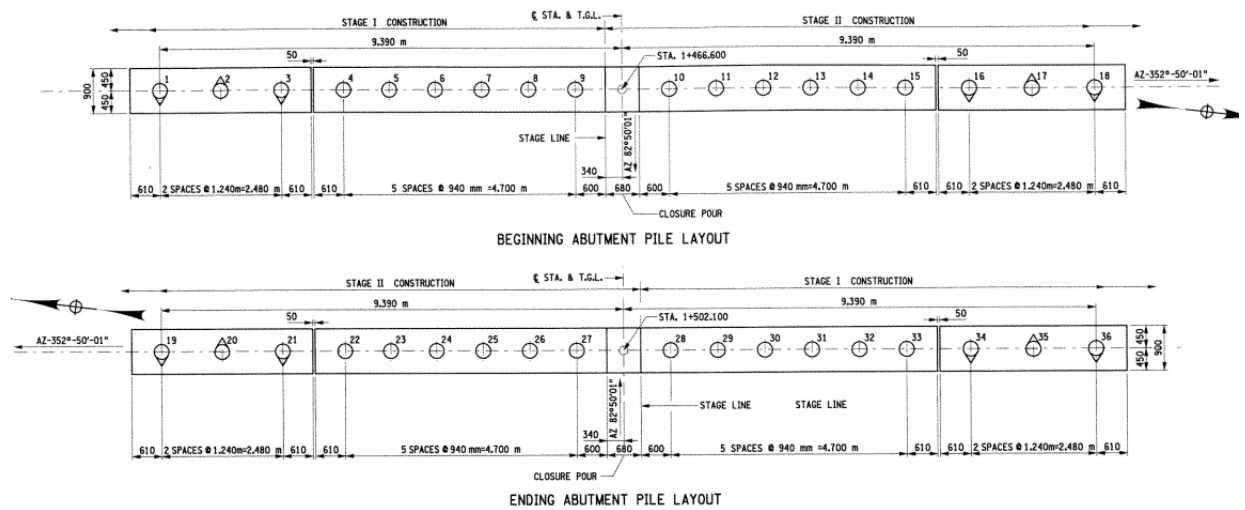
Pile layout of Arthur Road Bridge over I-87 S.B.
